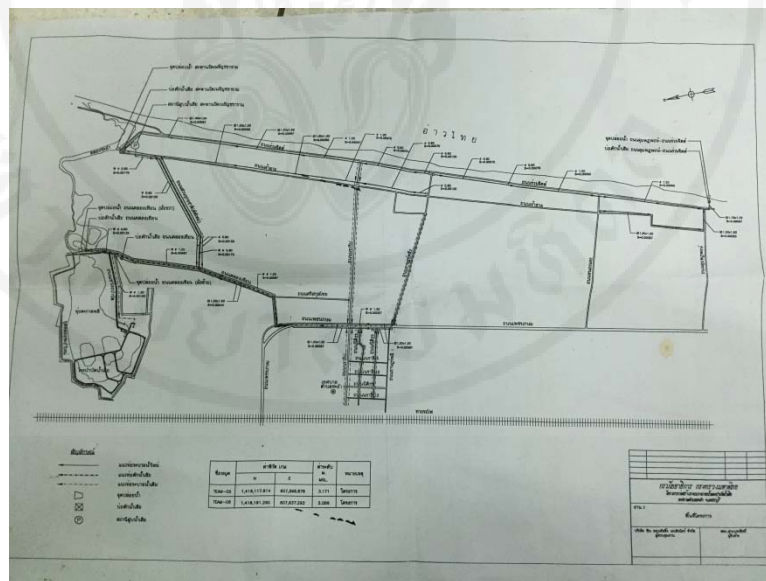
Wastewater Collection System & Wastewater Treatment Pond
